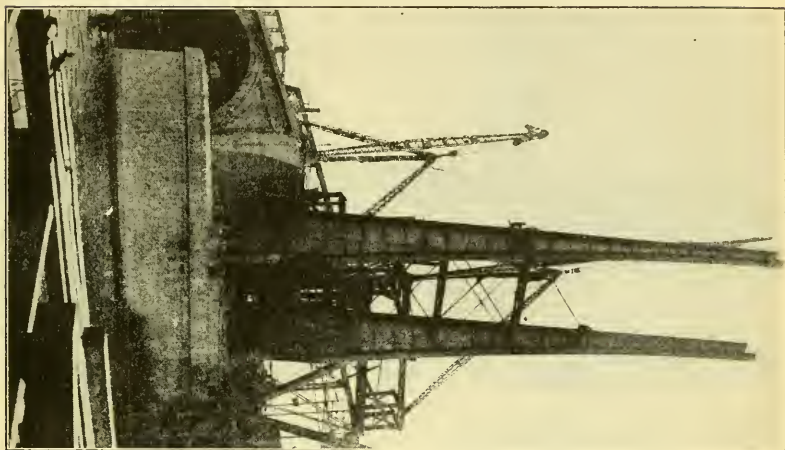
ERECTION OF BASCULE GIRDERS, PIER III.
